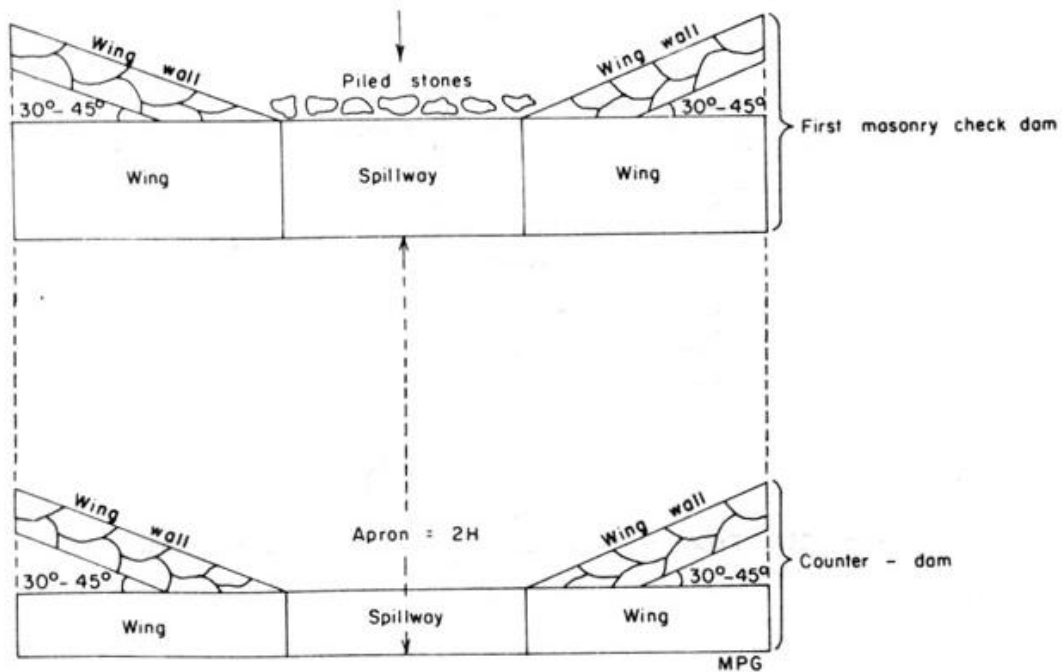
Top view of the first Masonry Check dam and Counter dam
